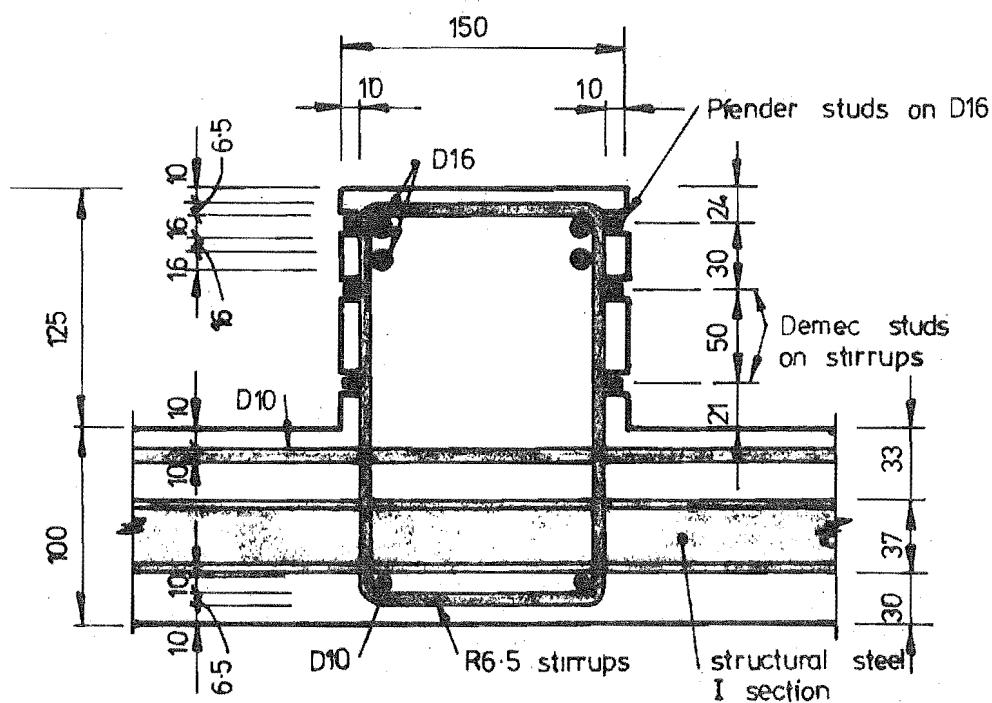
PFENDER GAUGE POSITIONS ON TOP AND BOTTOM REINFORCEMENT PLACED TRANSVERSELY ACROSS WALL TOES.
